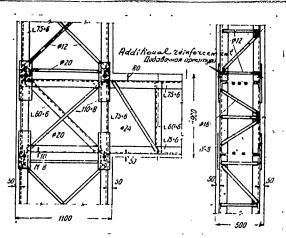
Connection between the steel welded skeletons of a cross girder and a . column.
